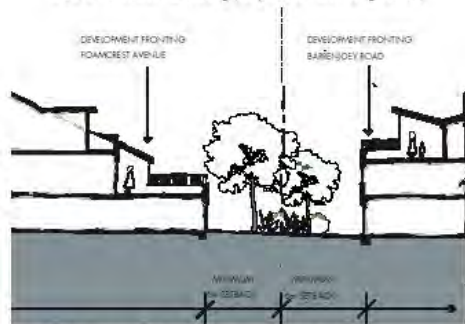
Barrenjoey Road and Foamcrest Avenue: Rear setbacks
